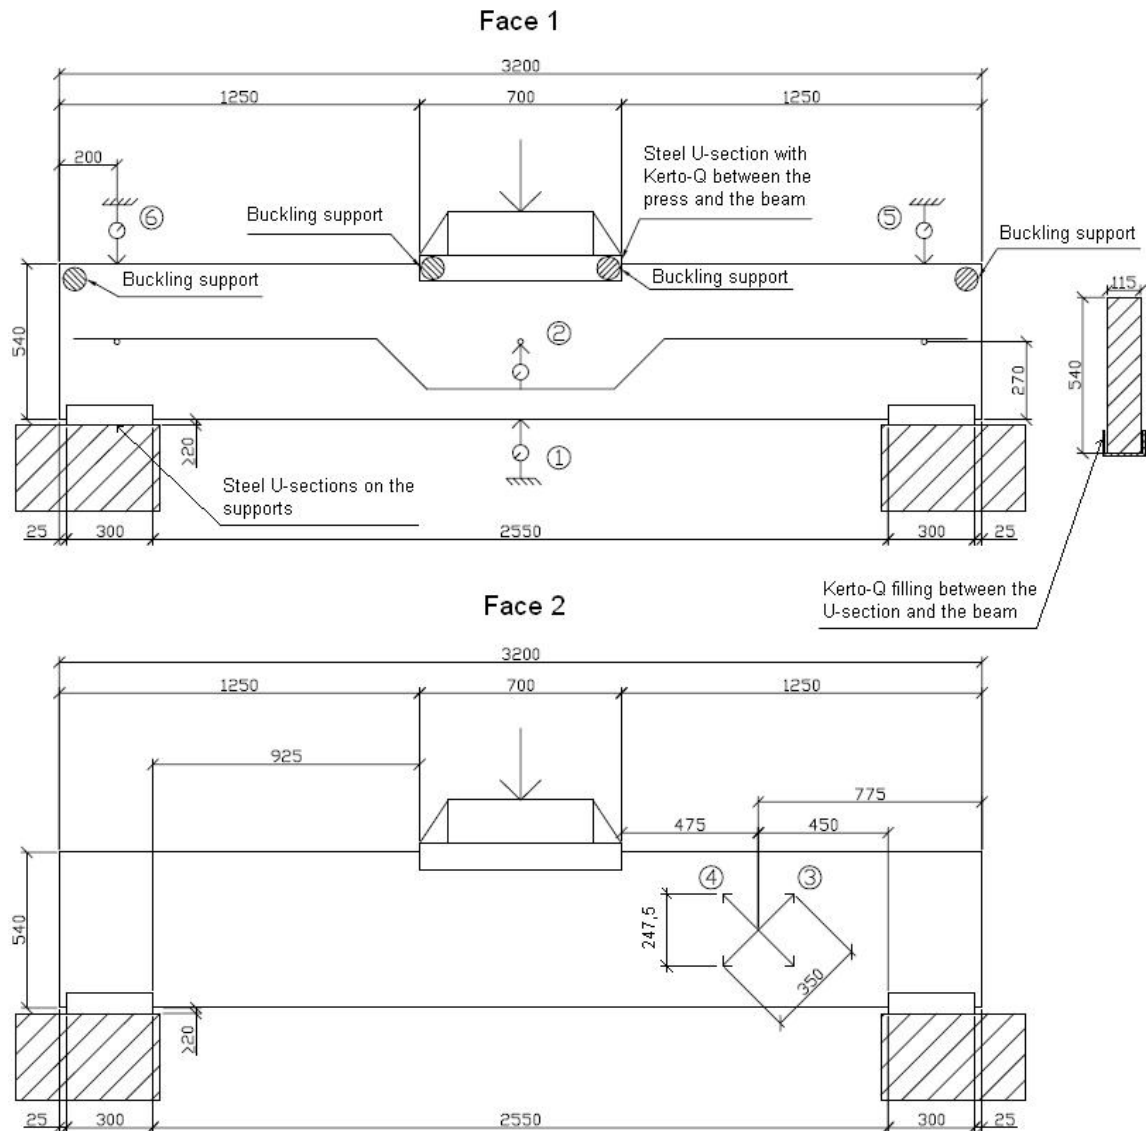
Test setup, dimensions and numbering of gauges, dimensions are in millimetres.
